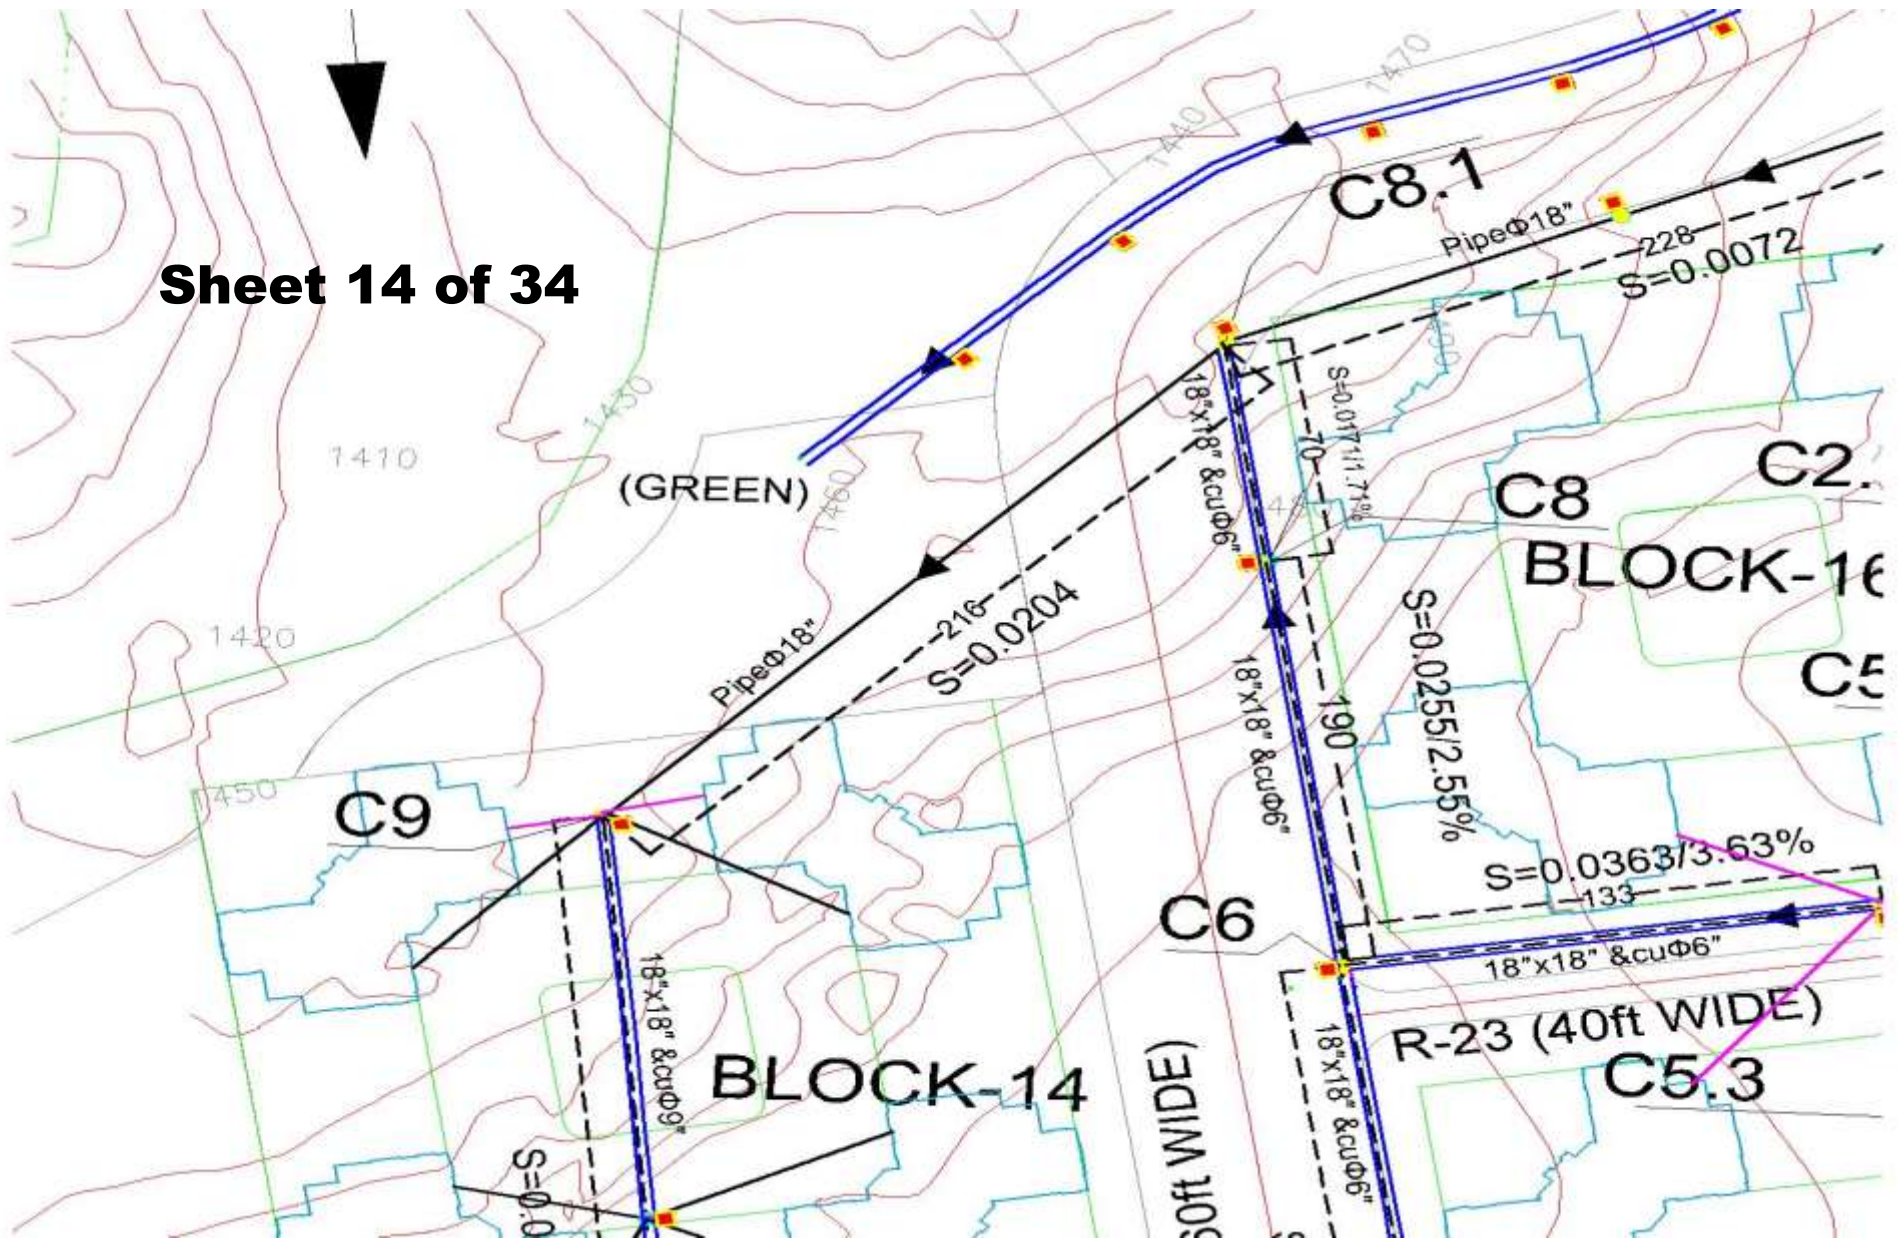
Combined drainage layout plan of Zone-3 near Block-15 & Green
